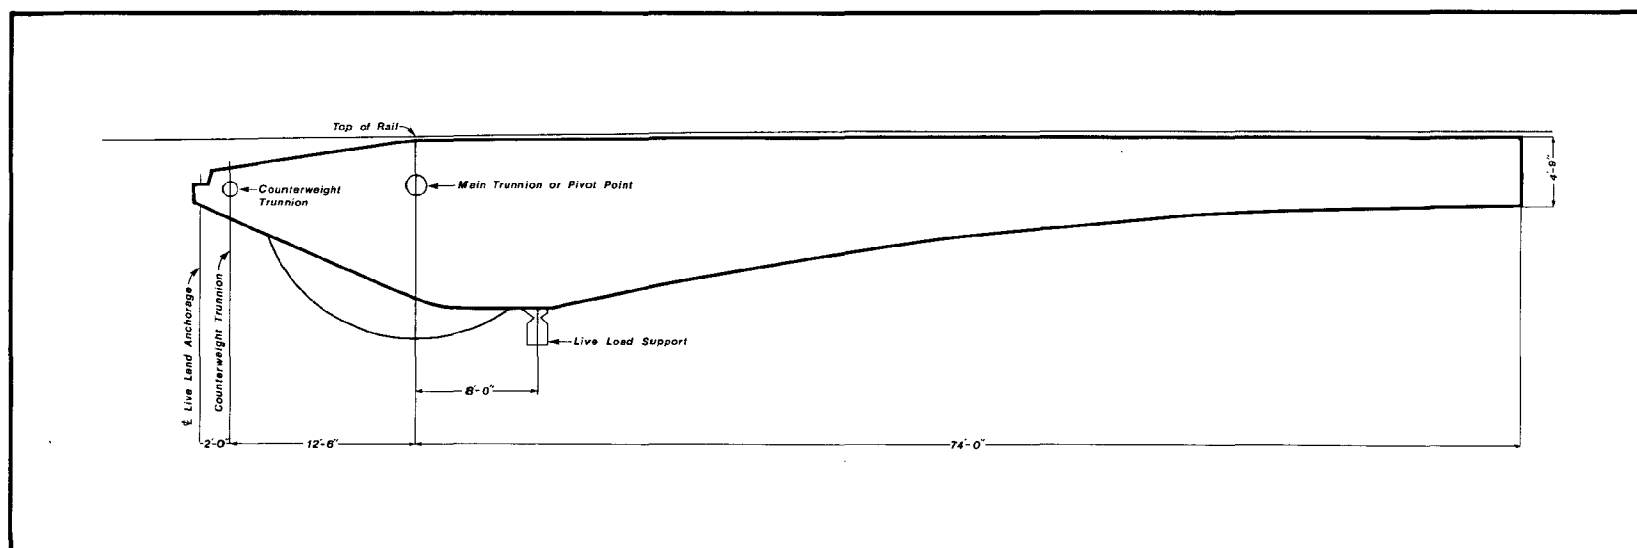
Lift Span Bascule Girder. The key 66-foot girder section extending from the live load support to center-span would have to accept loads imposed by seven axles. Bascule girder section properties are particularly important if a two track system is to be preserved.
